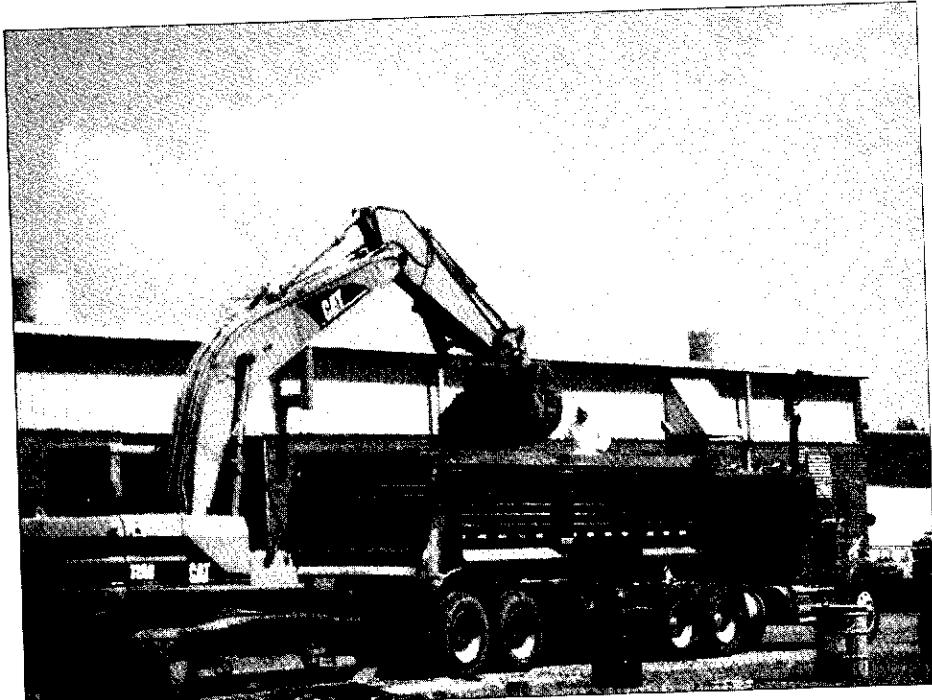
LOADING OF CONTAMINATED SOILS FOR DISPOSAL
